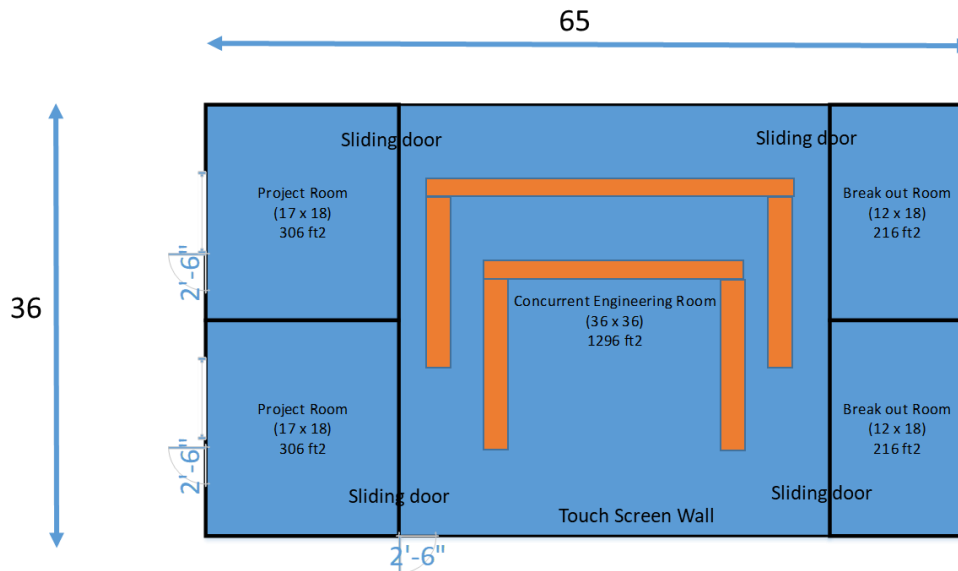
The proposed floor plan for the Mission Design Center in the new engineering building currently being planned at NASA Ames Research Center. Ames plans to have the new engineering building completed in 2024. Note the large concurrent engineering room which is adjacent to two project rooms. The project rooms are each dedicated to one concept study, giving the MDC capability of running two concept studies at the same time with dedicated spaces. The break-out rooms serve for impromptu meetings during the concurrent engineering sessions.
